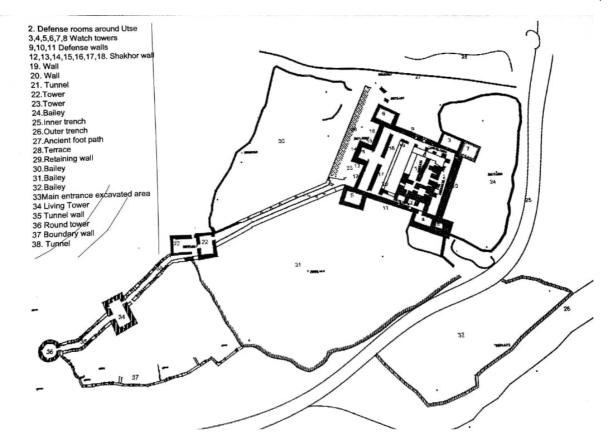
Layout plan of the Chubjakha Dzong ruin (Della Casa et al., 2013)
